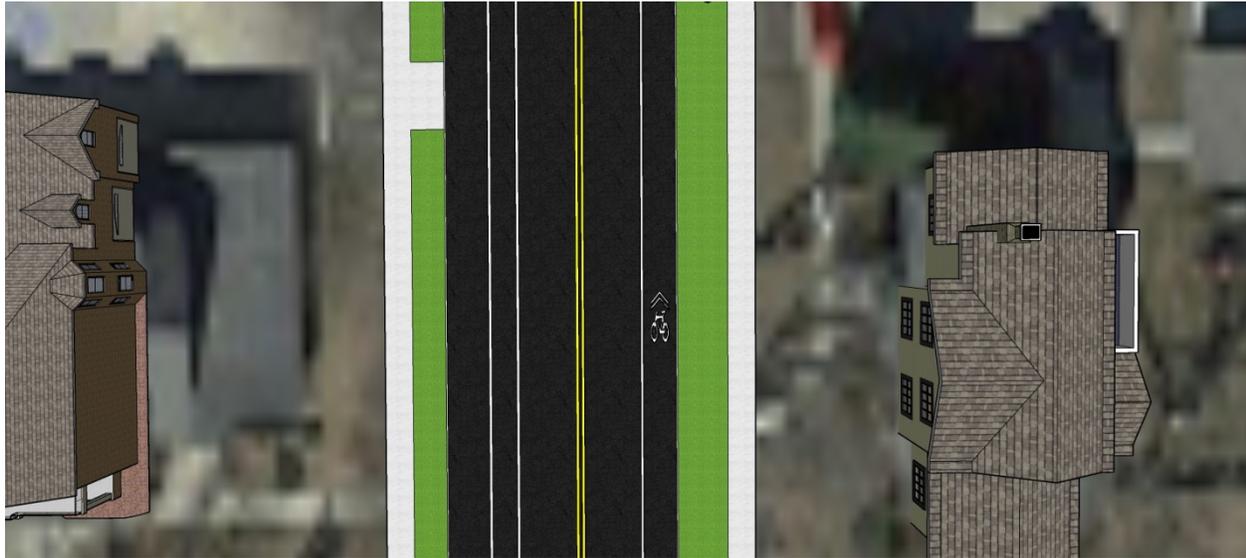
Street layout and reduced parking between 4<sup>th</sup> St. NE and 3<sup>rd</sup> ST. NE
